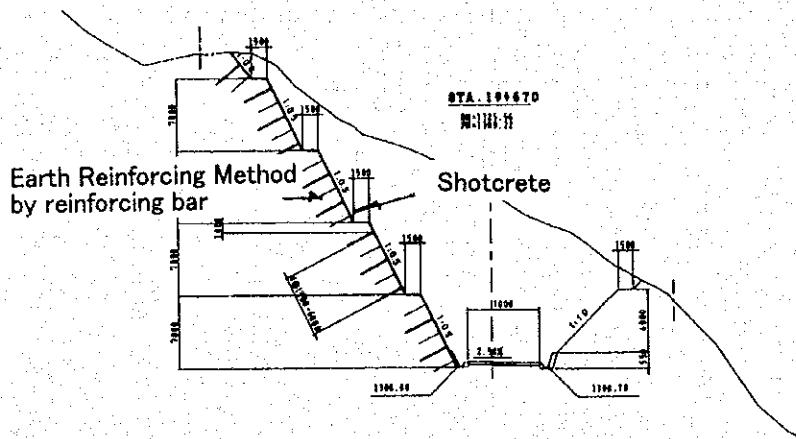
Slope Protection Works on High Cutting Slope
